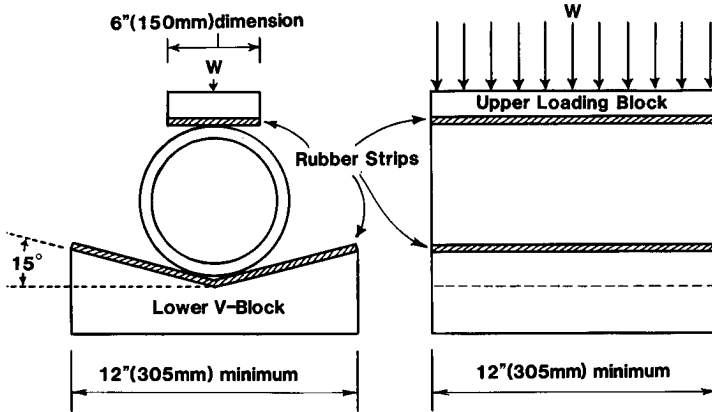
Assembly for Three-Edge Vee-Shaped Crushing Strength Test
